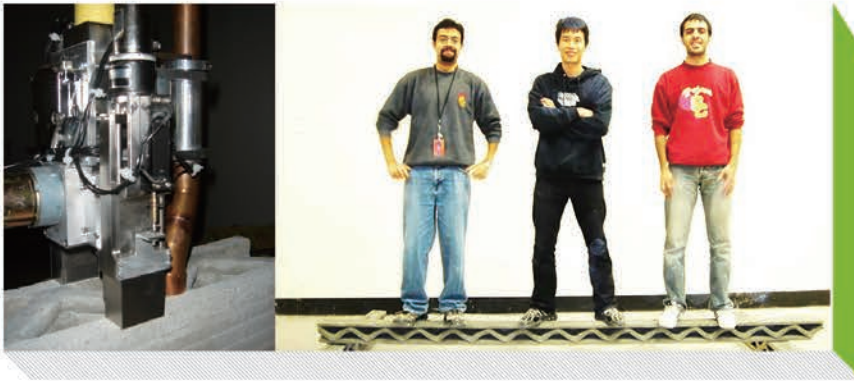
Left: CC nozzle assembly for solid and hollow concrete walls – Right: Demonstration of strength of thin hollow segment
